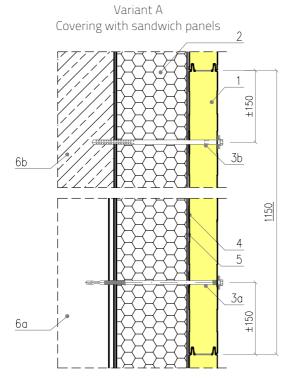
IzoPanel PIR/PIR+; MWF; EPS - assembly of additional elevation on existing panels
